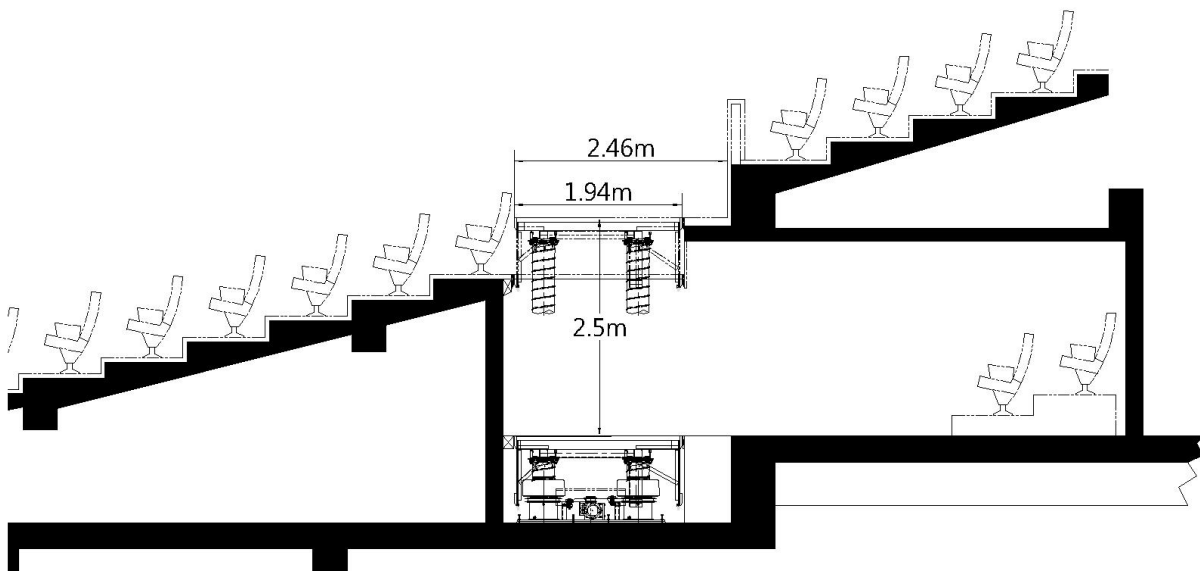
Auditorium Control Area Elevation Platform location plan
